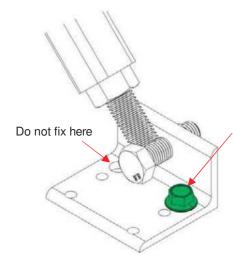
RITEK WALL® SYSTEM - PANEL BRACING CONNECTION DETAILS
